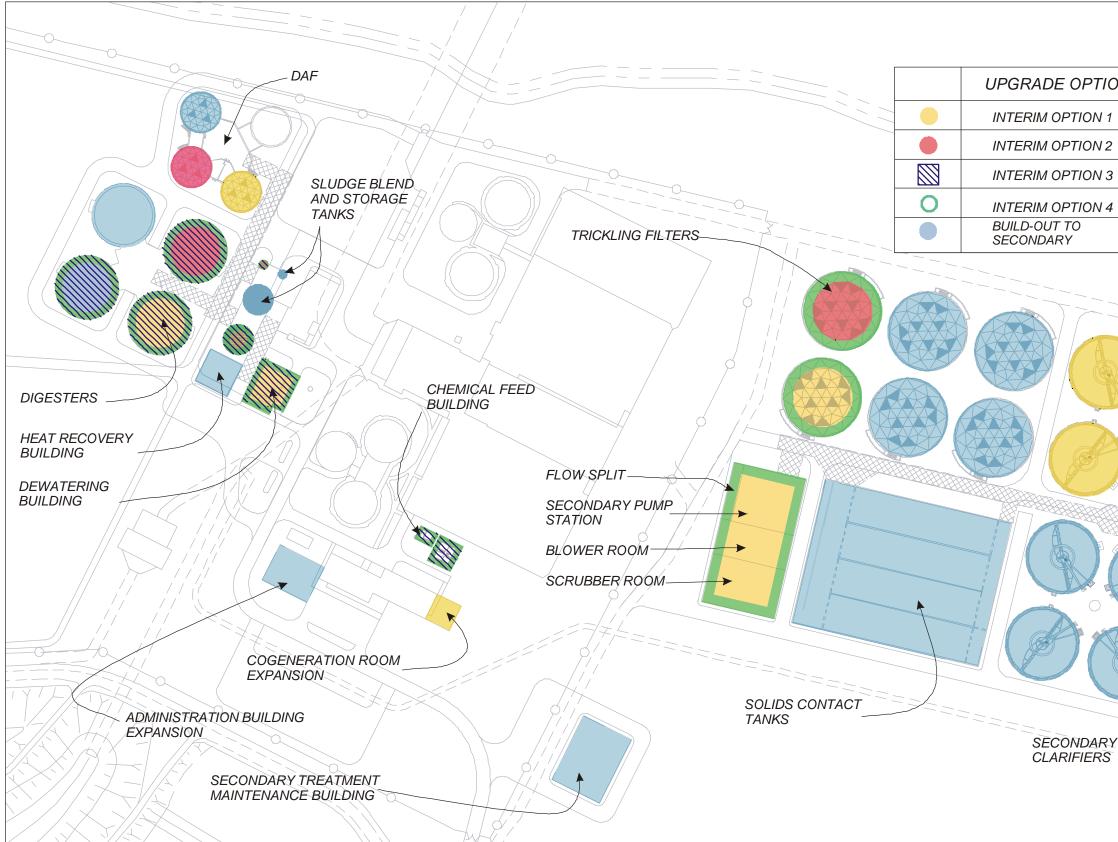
LAYOUT FOR TF/SC AT IIWWTP
